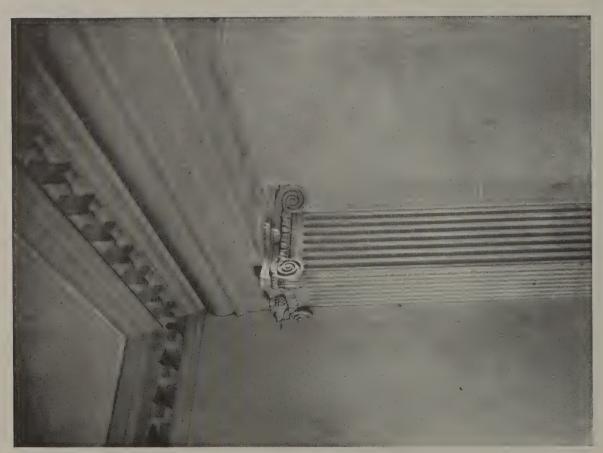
DETAIL OF WINDOW. SECOND FLOOR "WHITBY HALL"
